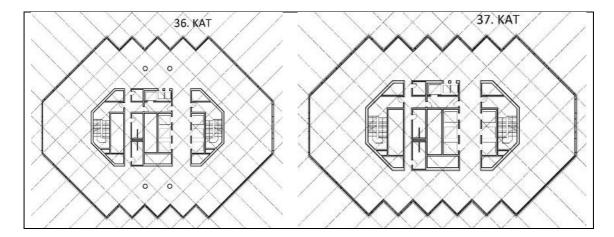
Thirty-sixth and thirty seventh floor plans of İş Tower
